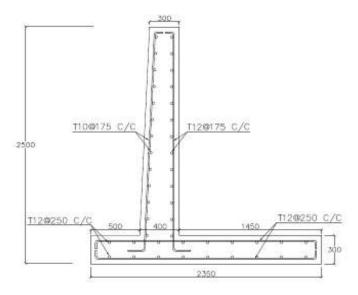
Details of the bending reinforcement used in the RC wall in STR (ULS)
